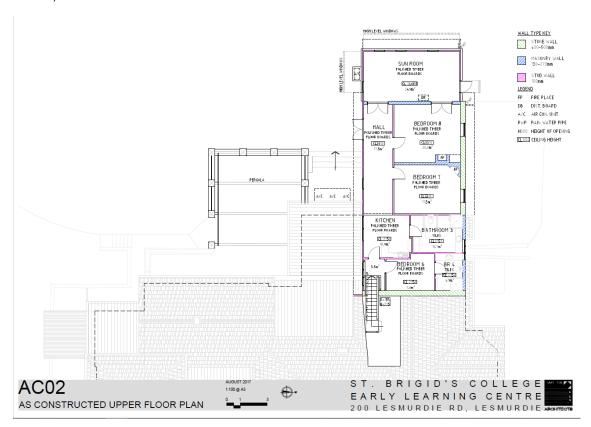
Existing upper floor plan, Courtesy Saleeba Adams Architects
